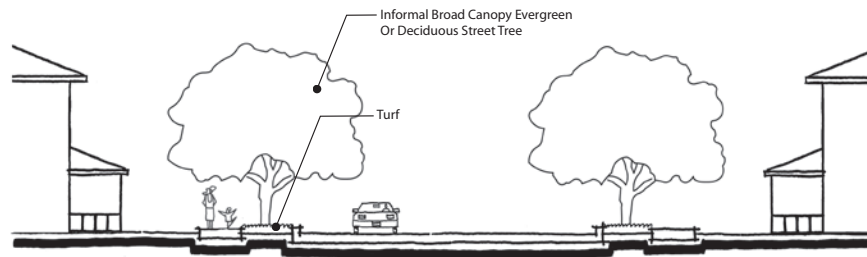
NEIGHBORHOOD STREET TREE CONCEPT PLAN
